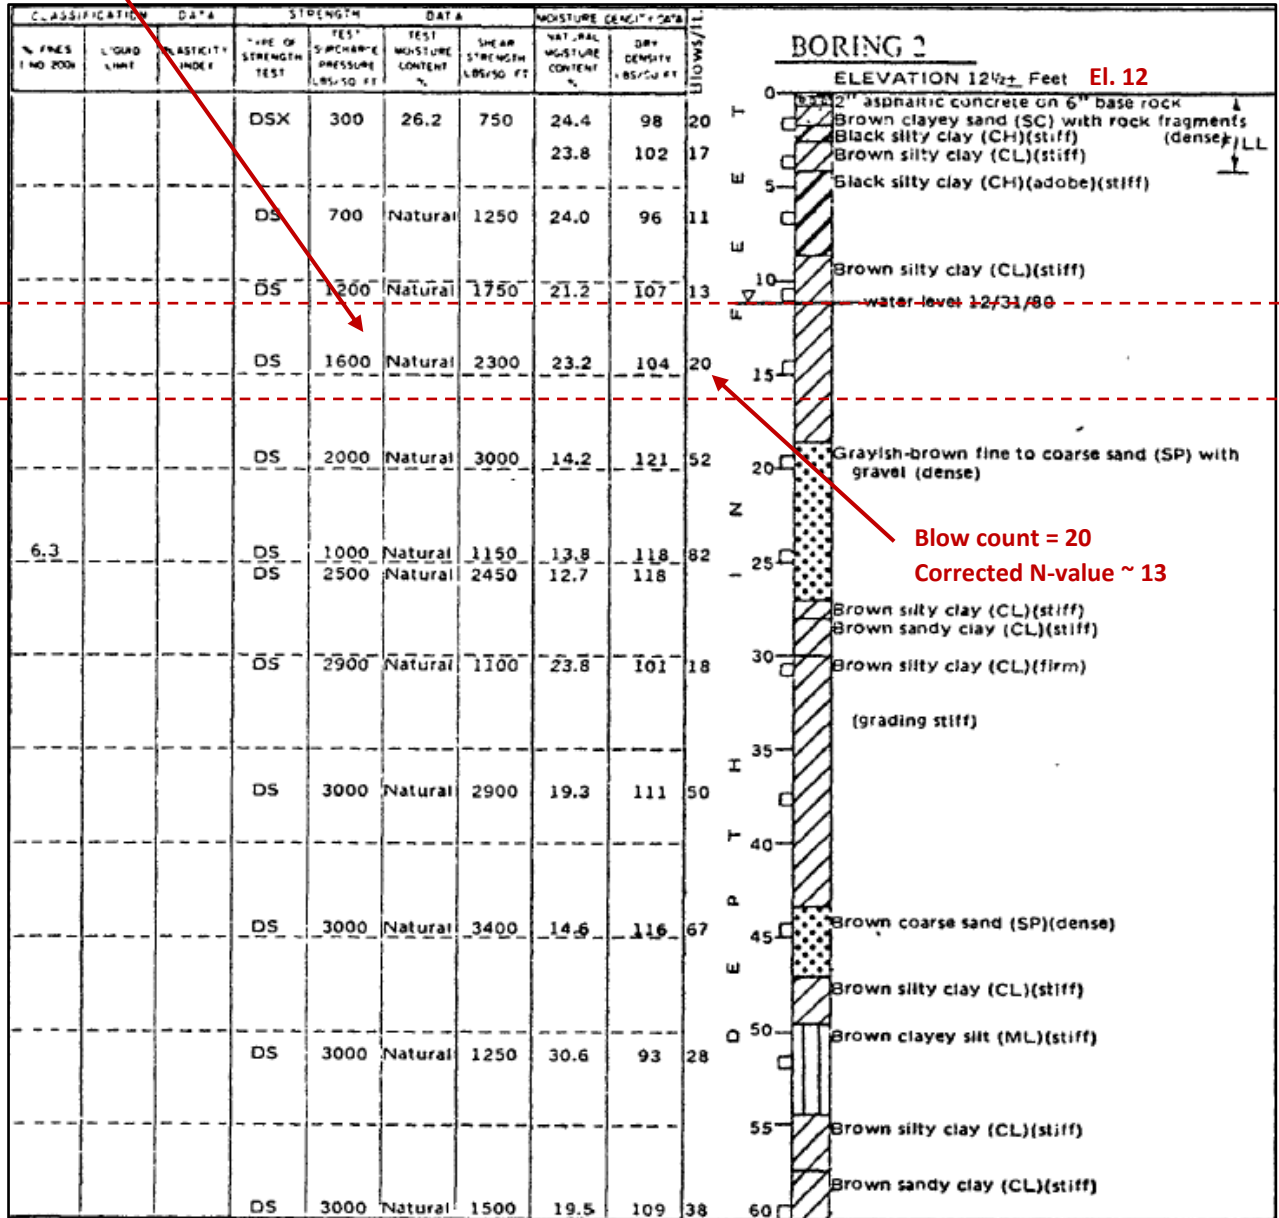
Test Boring B-2 at southern border of Hayward WPCP in 1981, shortly after EBDA construction approx. 800 feet north of crossing. (B-3 only drilled to 15 feet bgs)
